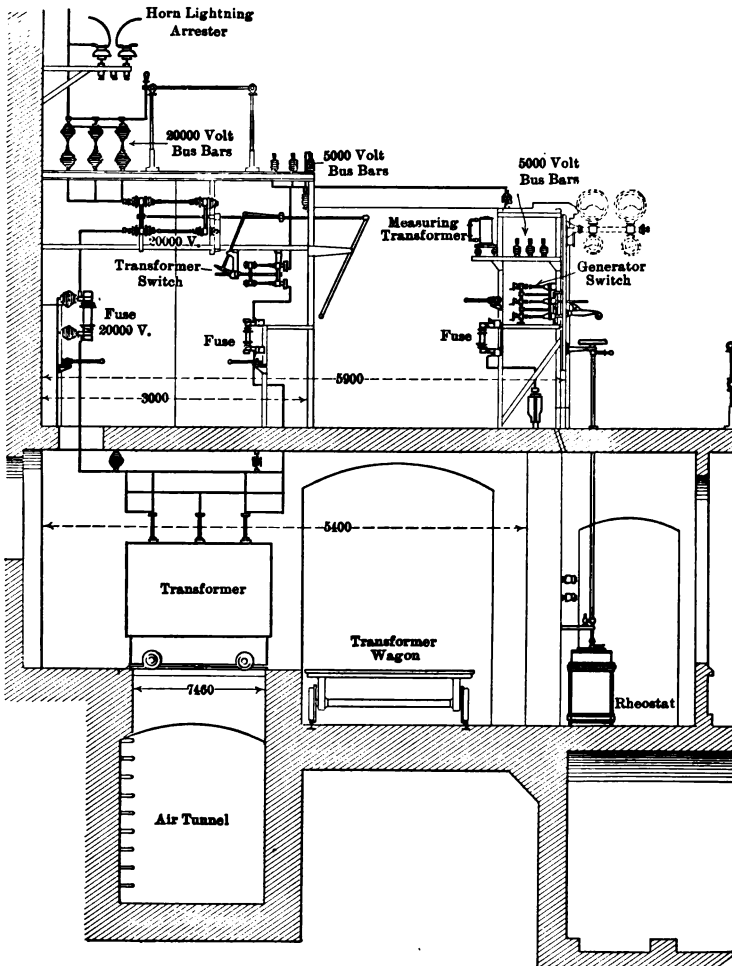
SECTION THROUGH TRANSFORMER AND SWITCH ROOM.
